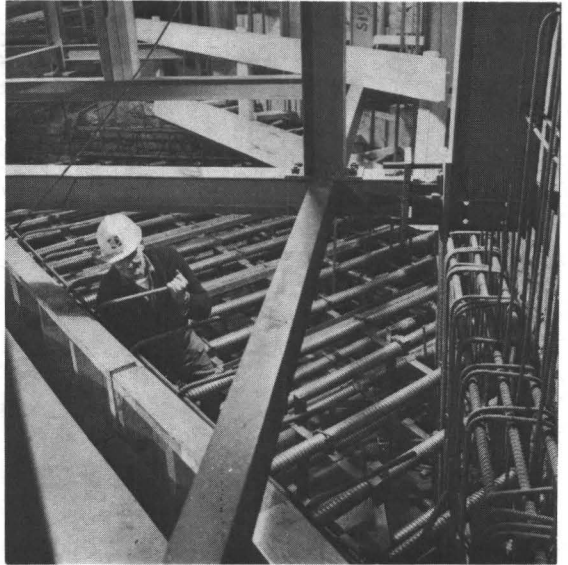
Temporary structural steelwork supports above the prestressing to the old Norman footings
